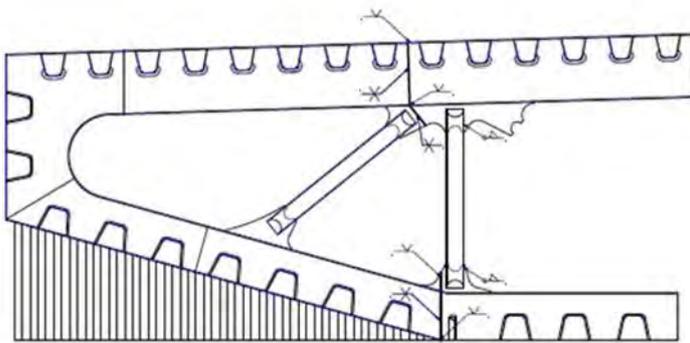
Assembly of top and bottom deck panels together with truss column
